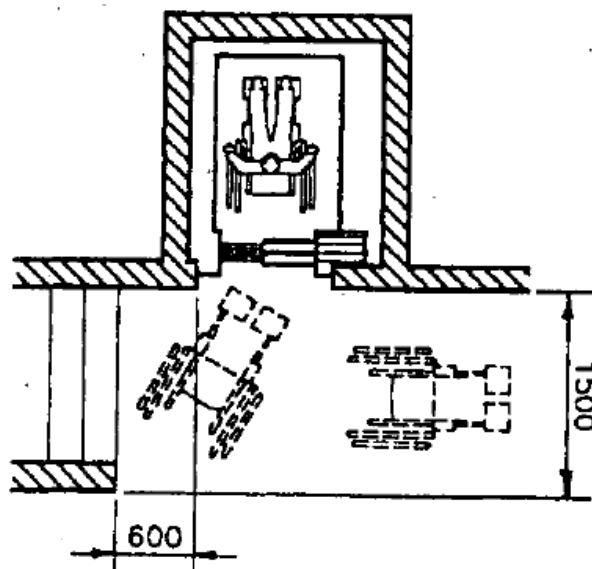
SPACE BETWEEN FRONT OF LIFT DOOR AND STAIRCASE LOCATED BESIDE THE DOOR
